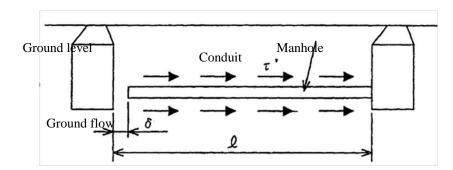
the pulling out length of pipe and manhole connection due to liquefaction (for PVC pipe with adhesive joint)
